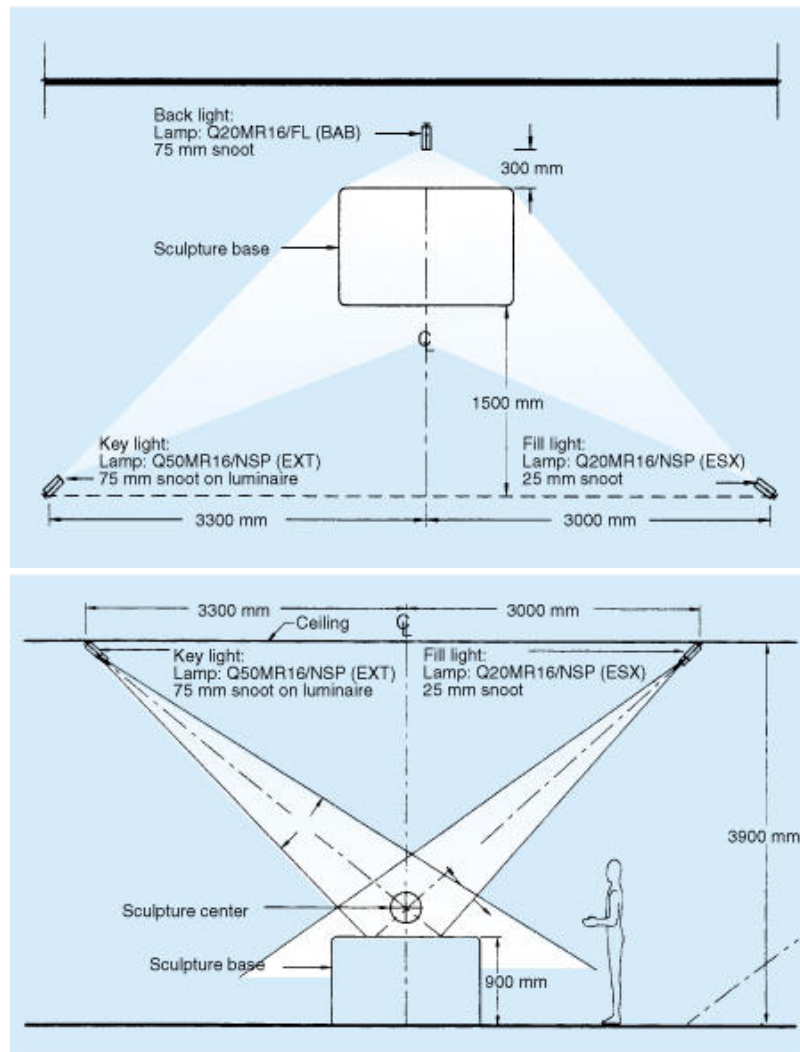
Sculpture lighting, *continued*. (e) Plan view. (f) Front elevation.
